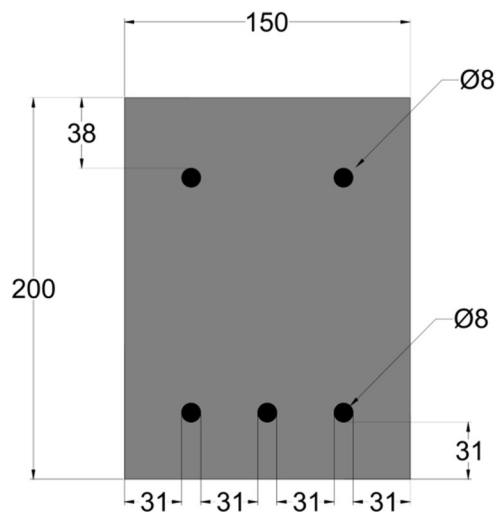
traditionally reinforced concrete beam setup (Huang, 2017)
